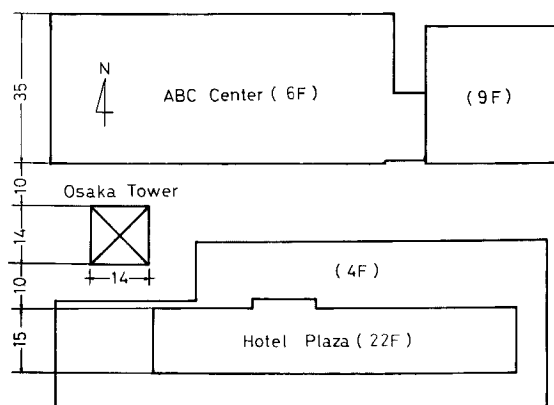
Site plan of area near Osaka Tower (unit: m).
